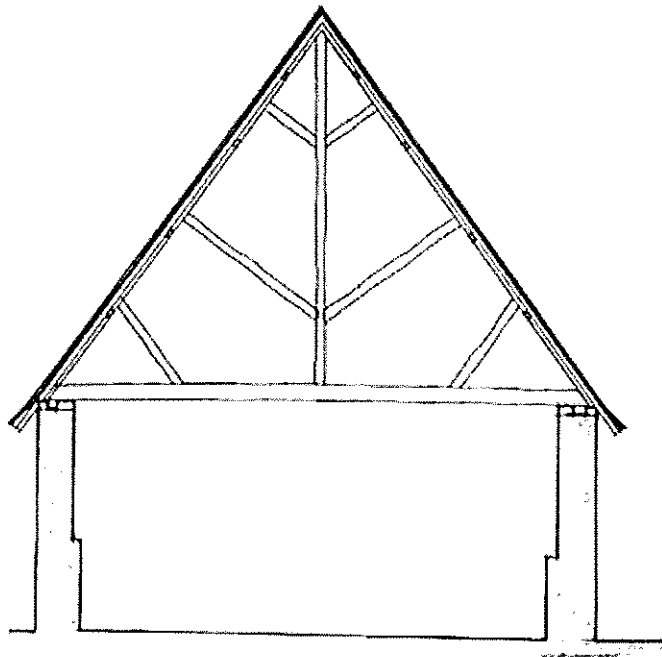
Form of the roof trusses in the eastern roof at Boxley Abbey barn
